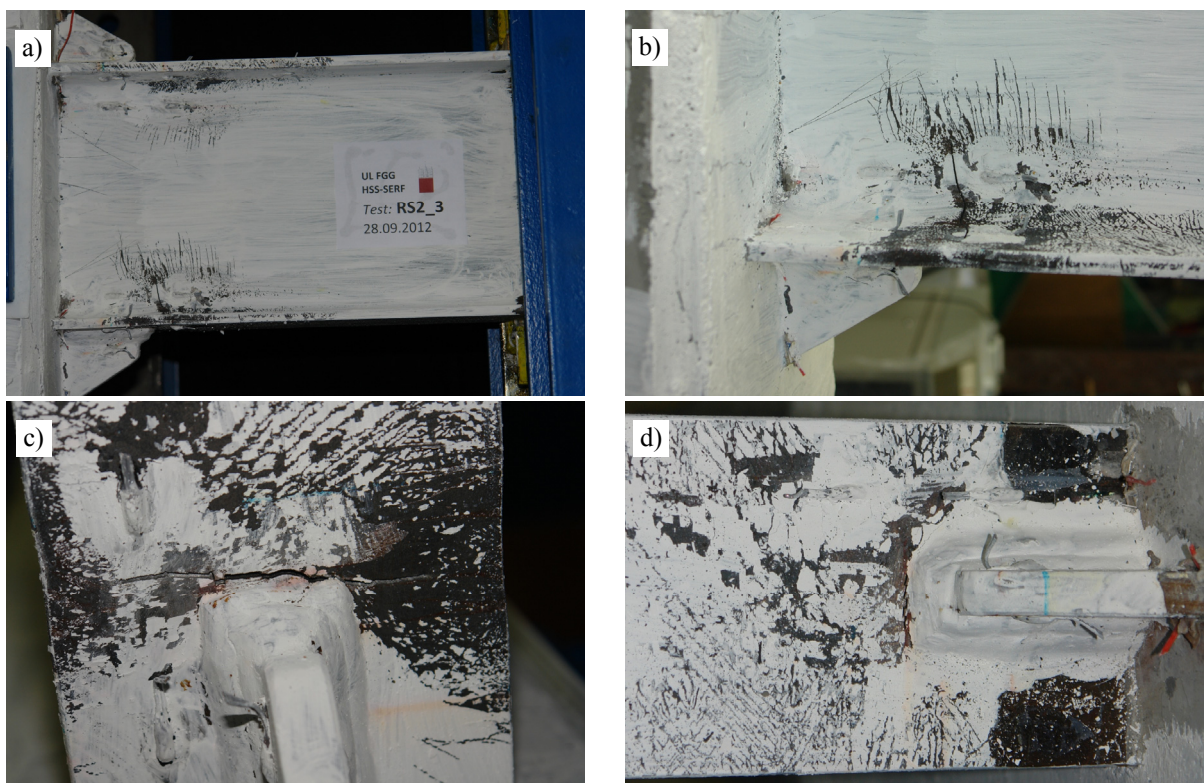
Specimen RS2.3 after the test: a) local strained area of the beam just after the stiffened section, b) fracture of bottom beam flange, side view, c) crack on bottom beam flange, d) damaged top beam flange
